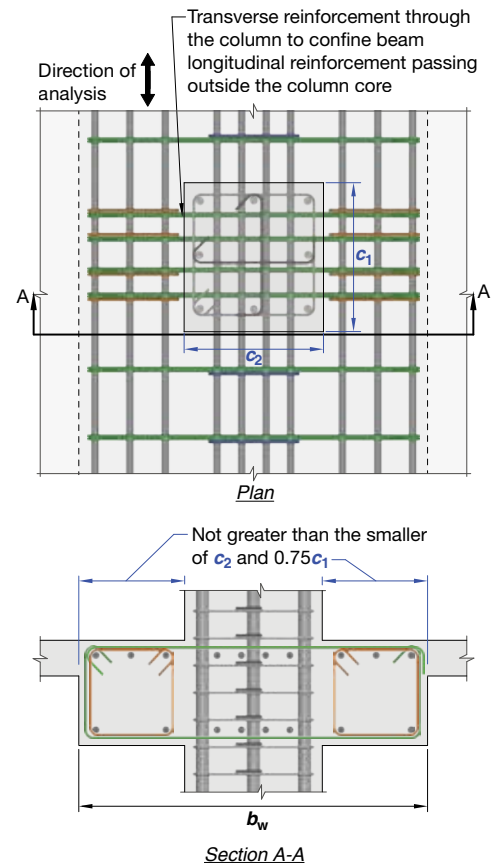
Fig. R18.6.2 from ACI 318 illustrates the maximum effective width allowed for beams in special moment frames. This limit can conservatively be extended to beams where reinforcement congestion at beam-column intersections is a concern.
